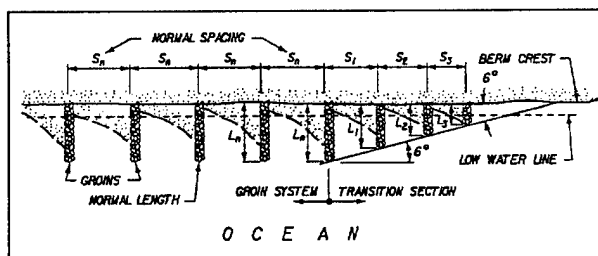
Transition section between groin field and beach not stabilized by groins
